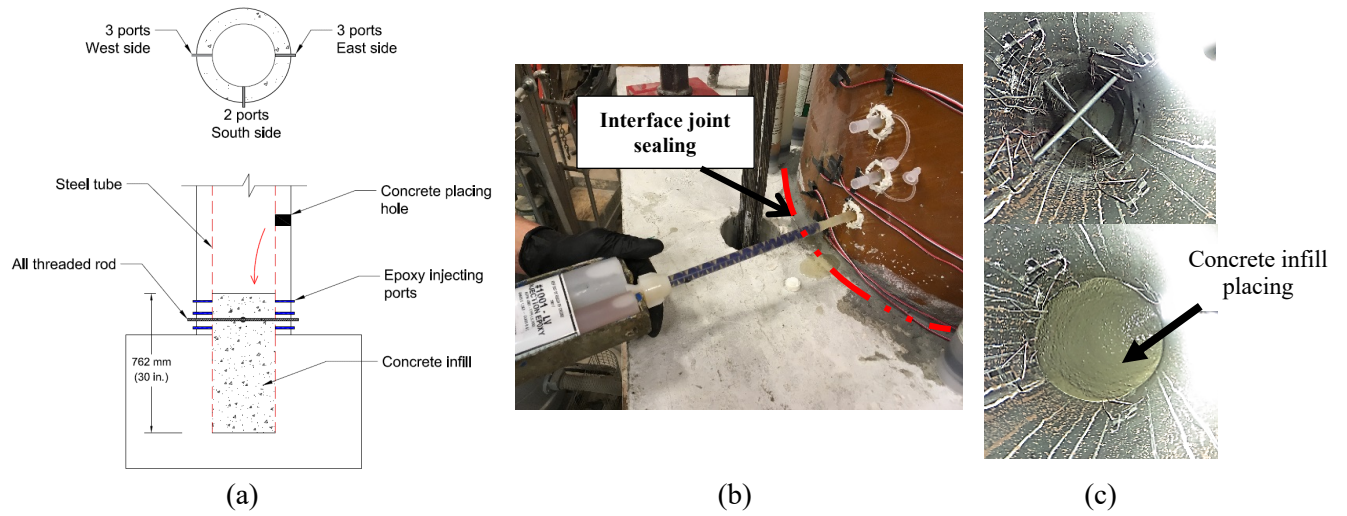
Steel tube concrete infill procedure (a) layout, (b) injecting the epoxy, and (c) all thread rods and concrete infill placing
